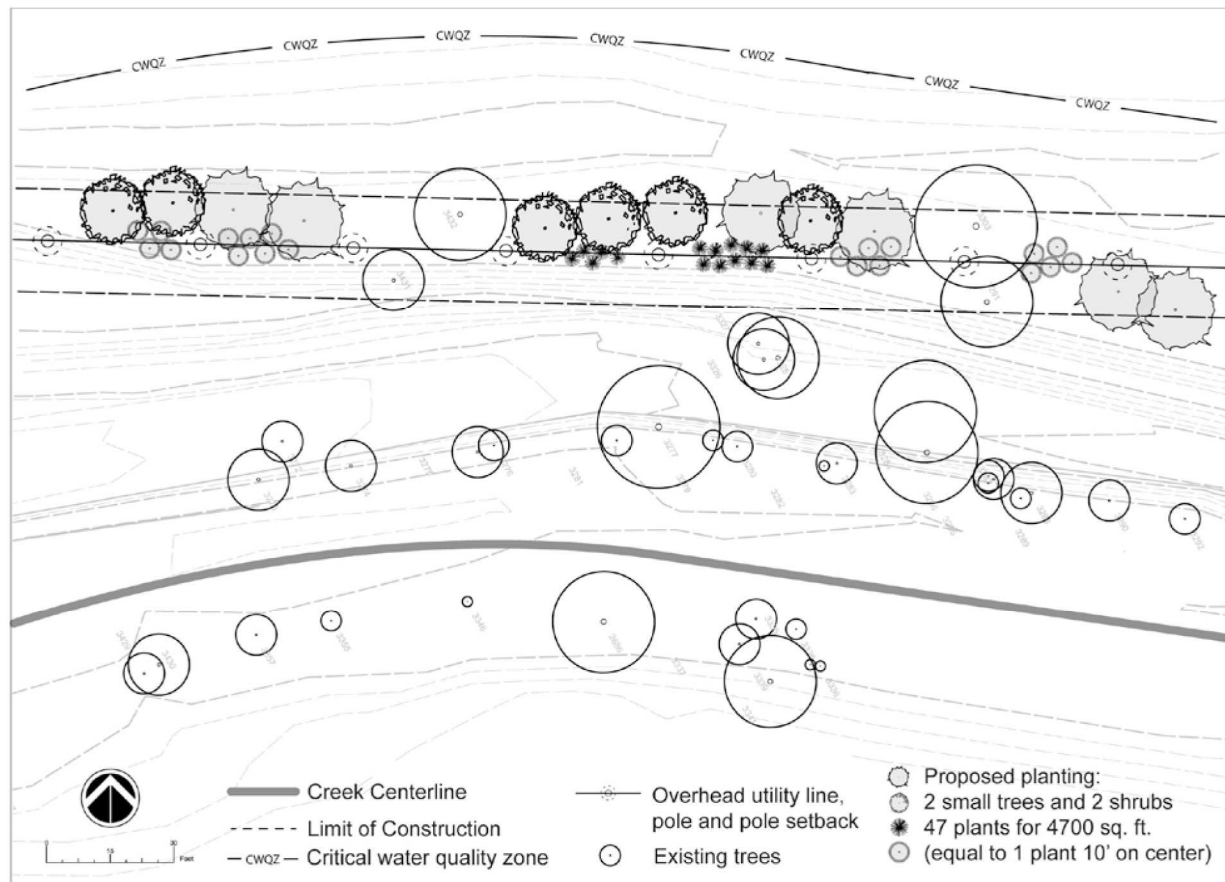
S.5-1: Example of Rooted Plant Layout and Calculation
